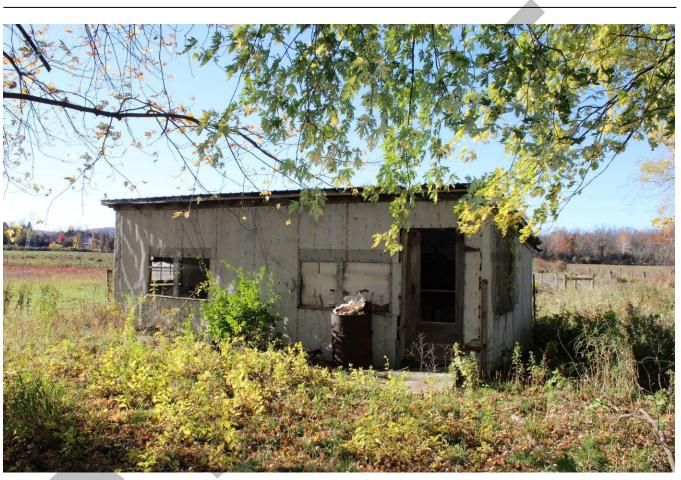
View of the east elevation of the "new" chicken house, camera facing west.
